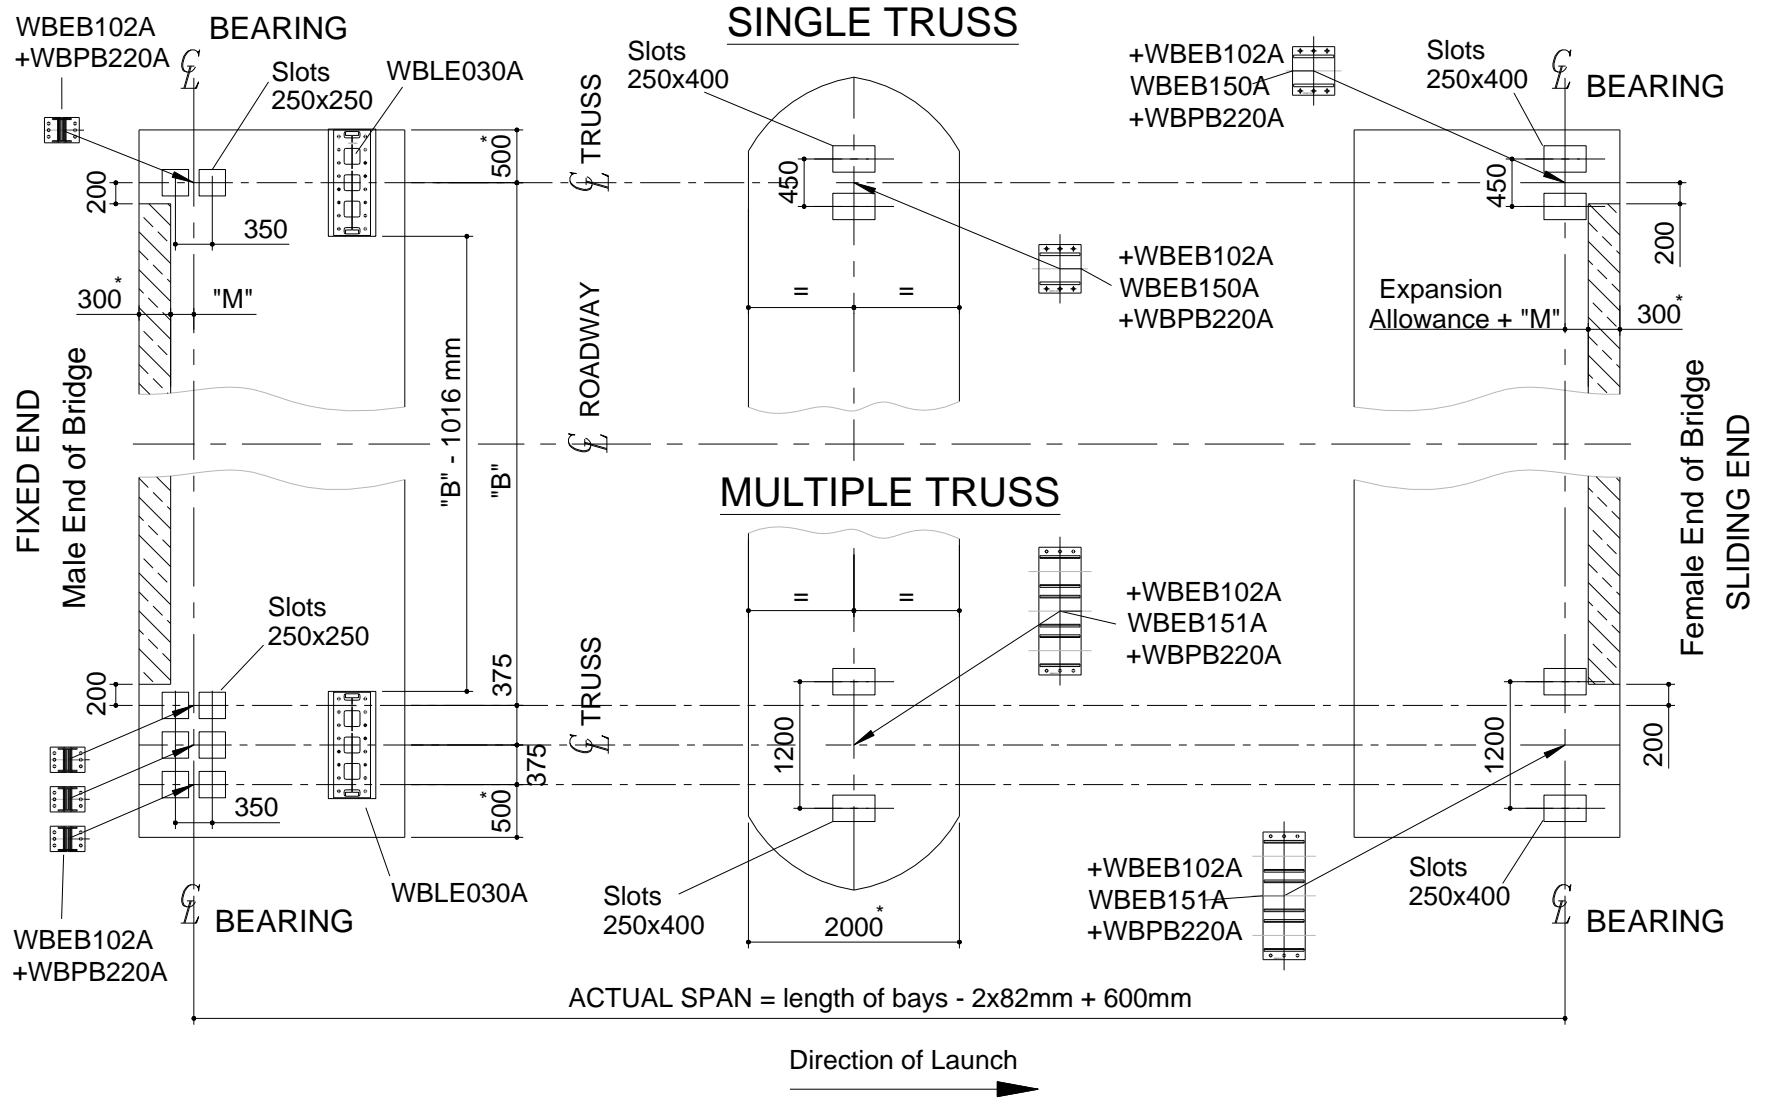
ABUTMENT, BEARING PLATES AND ROLLER LAYOUT FOR SPAN JUNCTION BRIDGES – TOP VIEW
